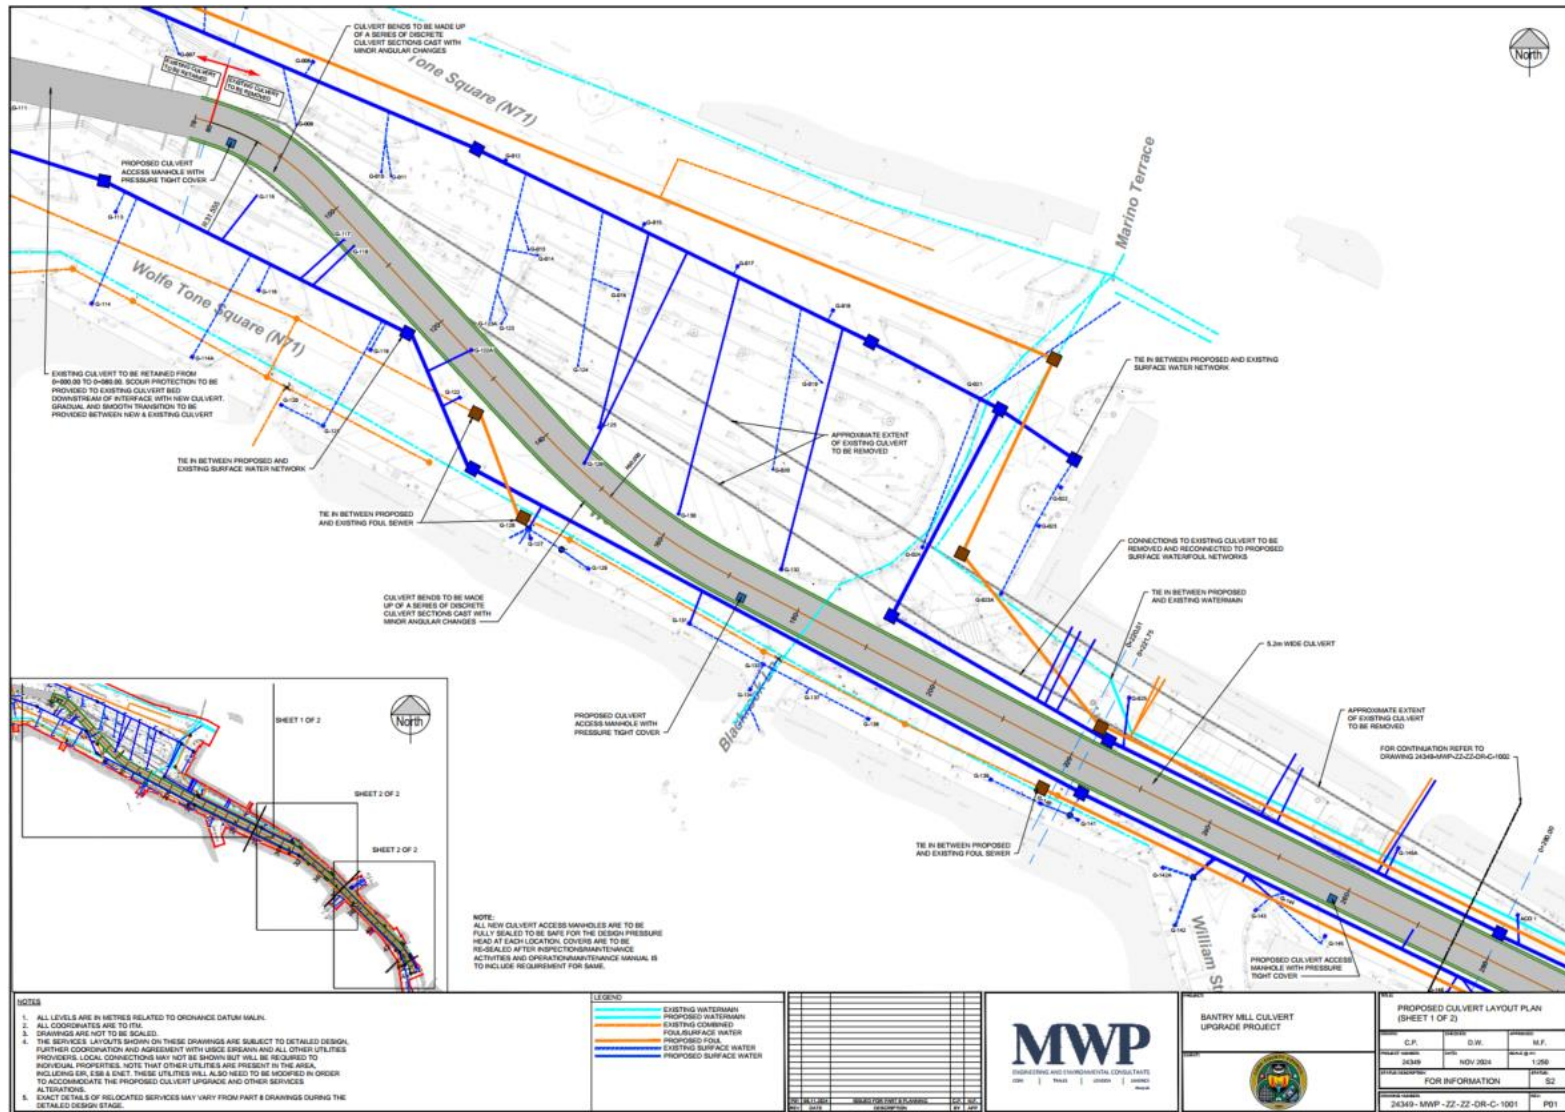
Proposed Culvert Layout Plan (Sheet 1 of 2)
